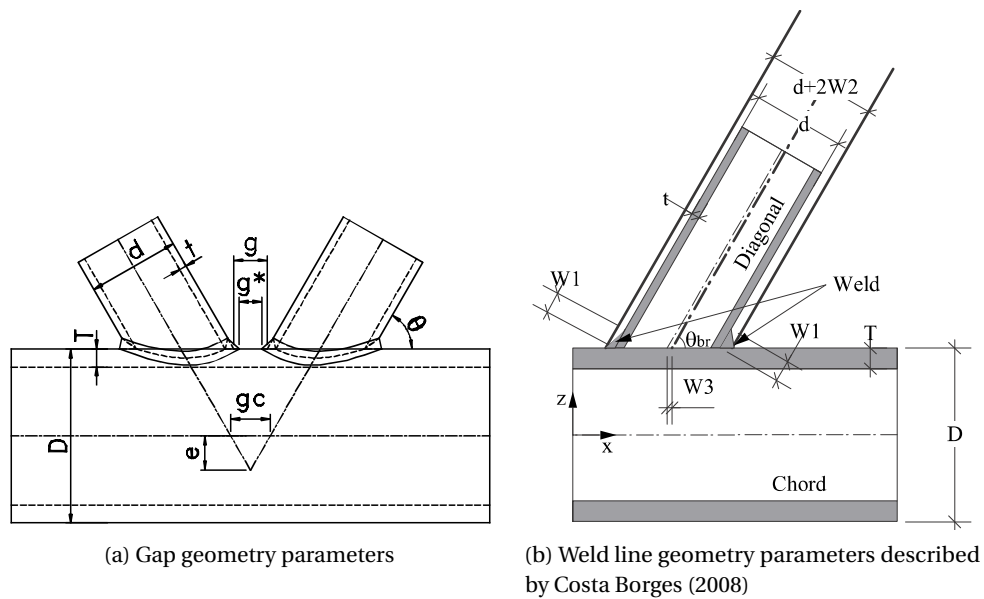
Various parameters defining the gap and the weld geometry in K-Joints.
